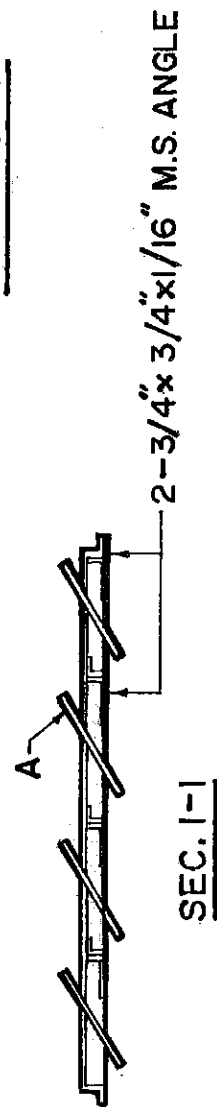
DETAILS OF BEAM B₁ AND BRICK ARCH (SEC-I)
